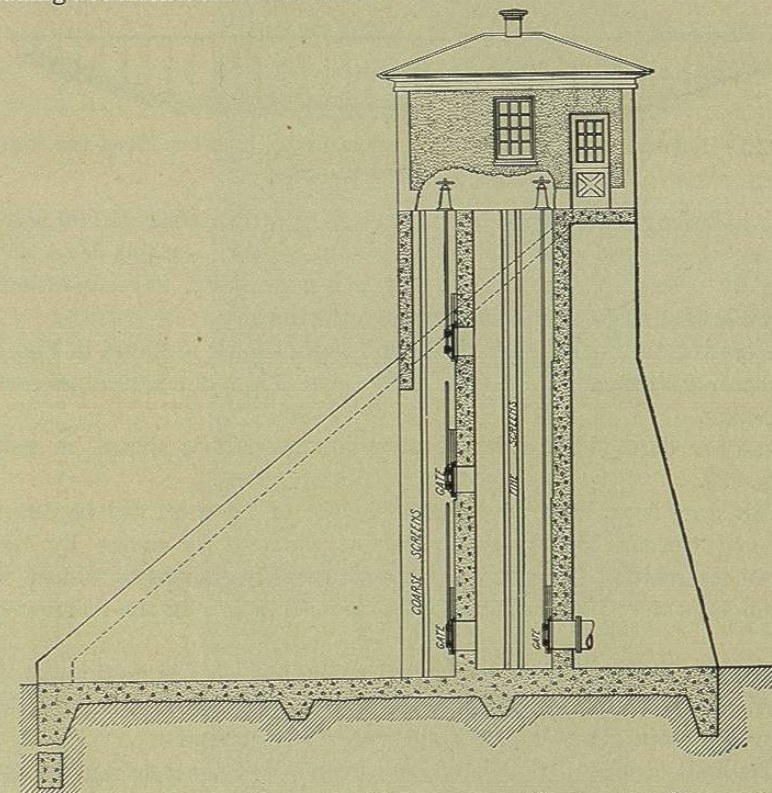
SECTION OF PITTSFIELD DAM, SHOWING GATE-HOUSE CONTAINED.
